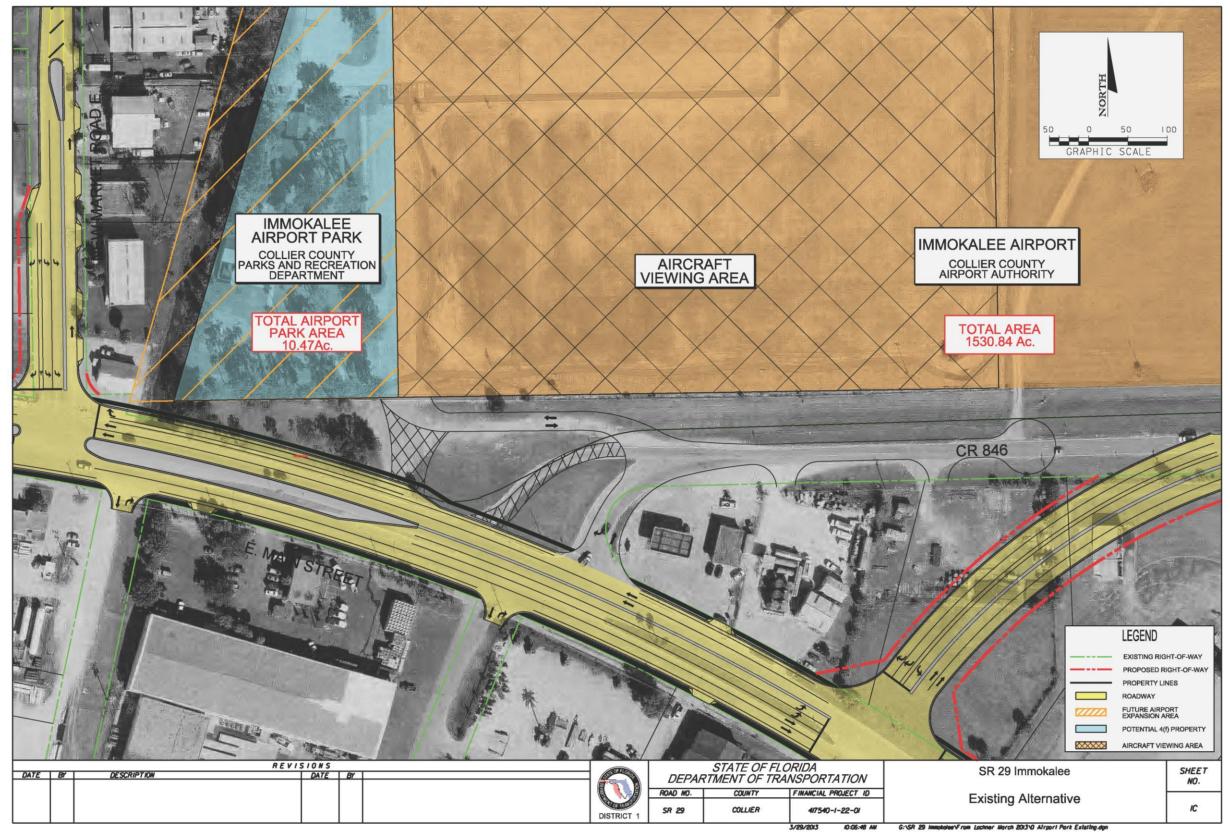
SR 29 EXISTING ALTERNATIVE POTENTIAL IMPACT TO IMMOKALEE AIRPORT PARK
